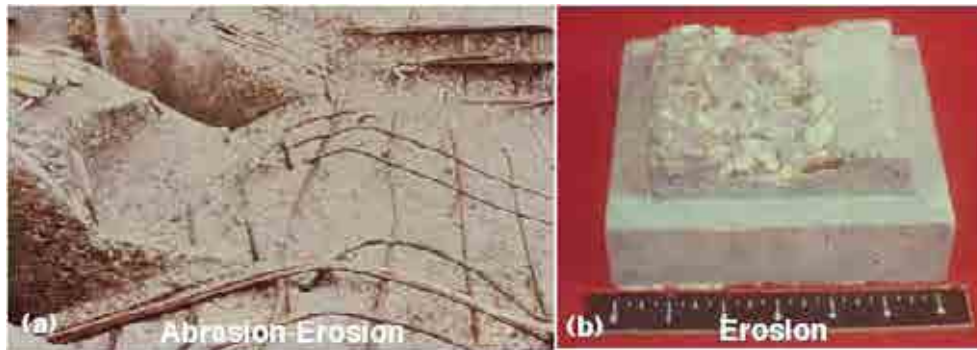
Abrasion-erosion of concrete: (a) abrasion-erosion damage in a concrete stilling basin [98]; (b) erosion of conventional concrete [97].
